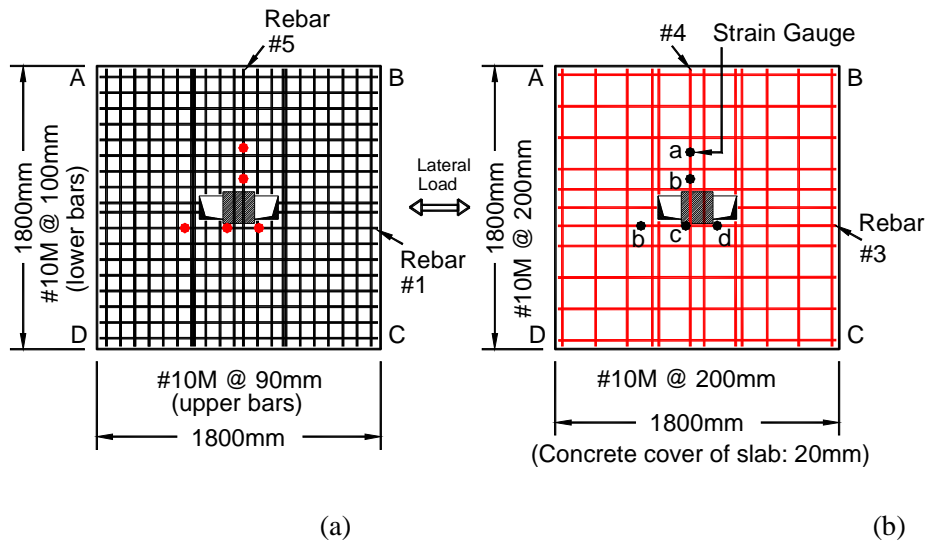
Reinforcement detail and strain gages in Specimen SW6, SW7 and SW8
